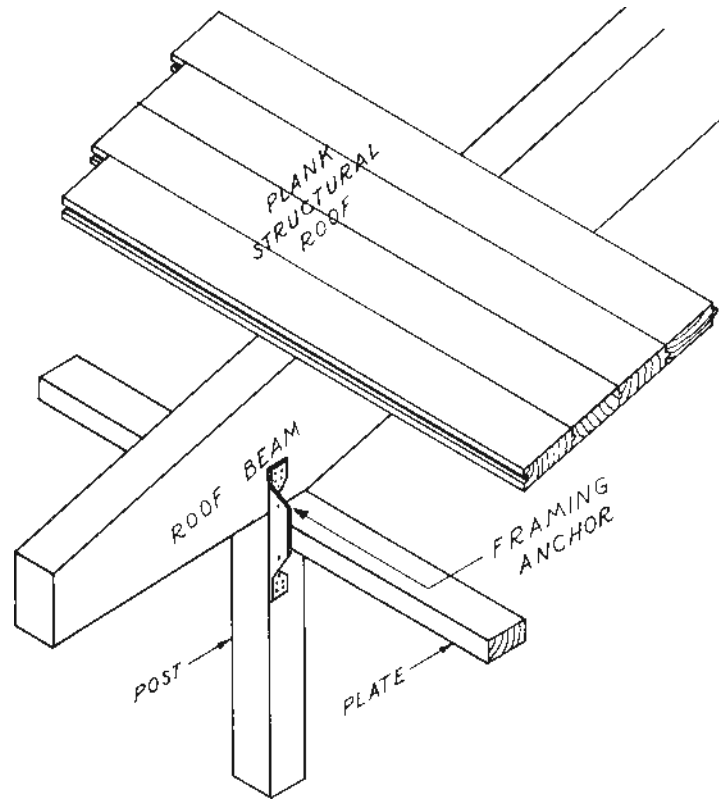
Roof Beam and Spaced Floor Beam Bearing at Exterior Wall
